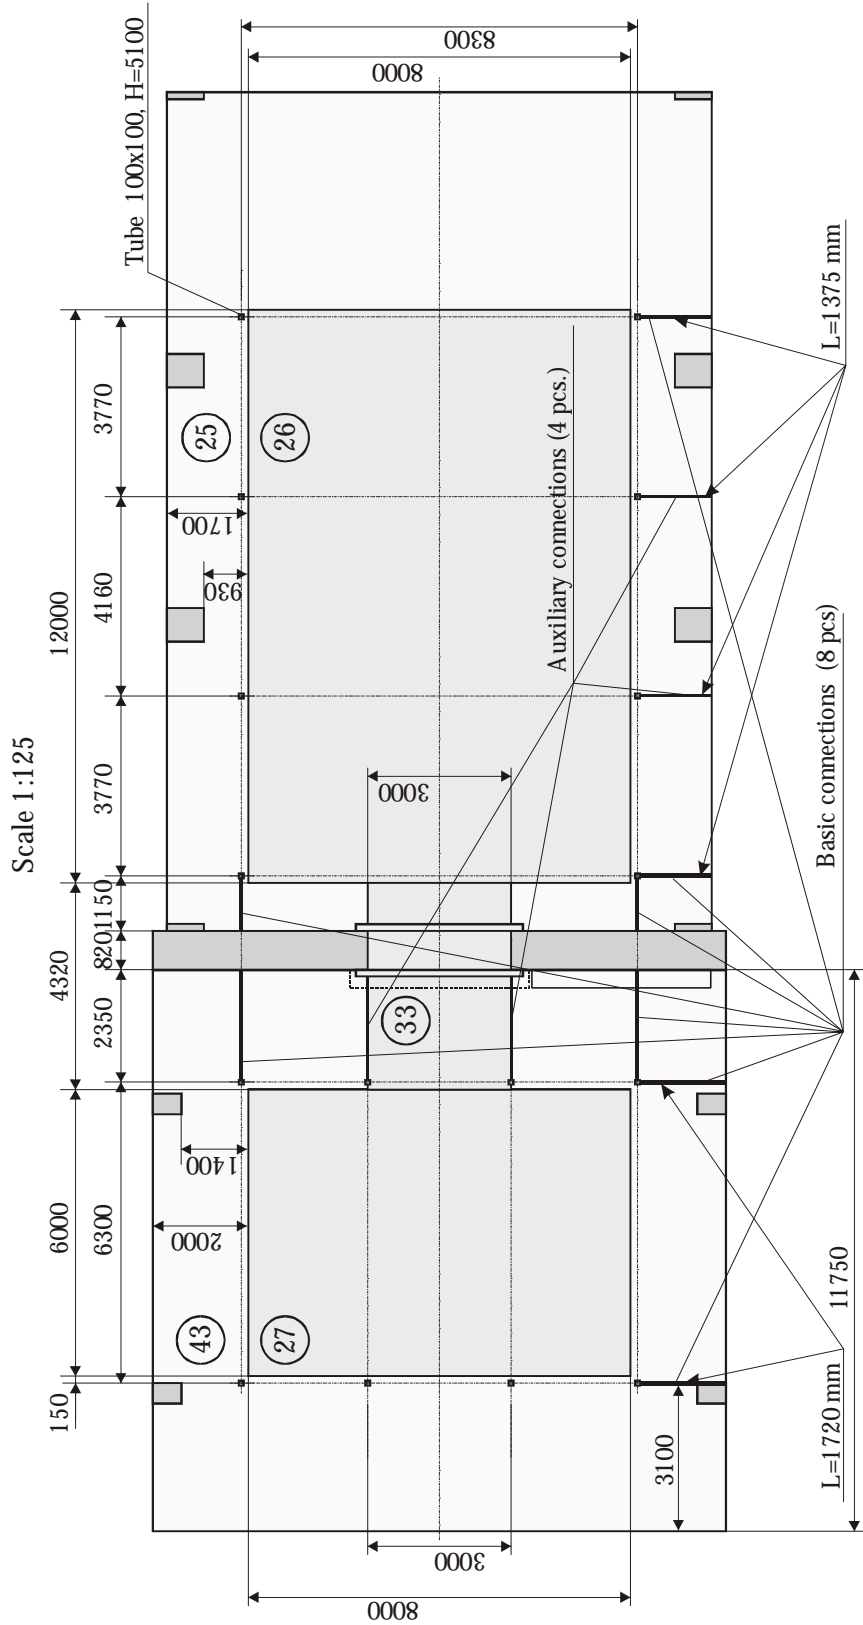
Clean Room Load-Bearing Frame Stubs Layout
